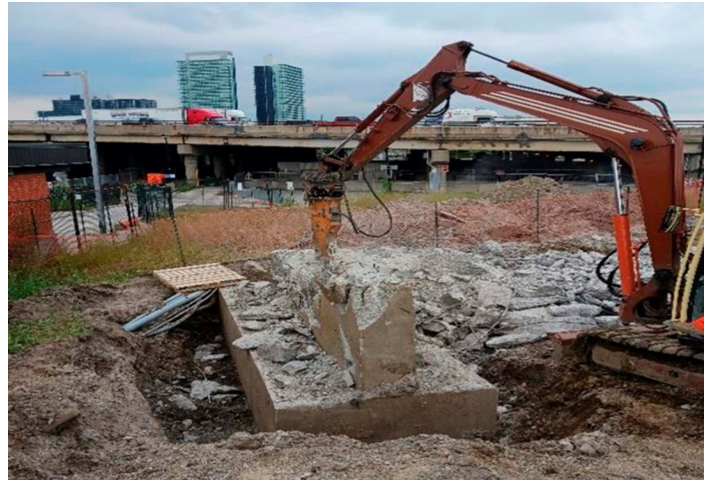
Demolishing an abandoned bridge foundation at the Leslie Street interchange.
